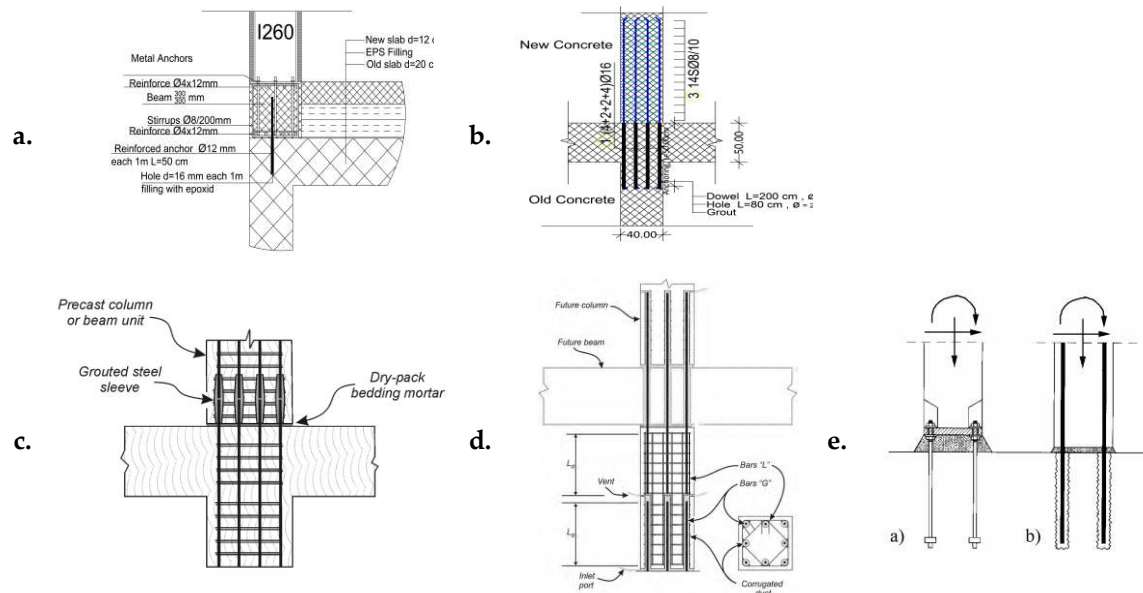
Several examples of connections executed in practice and from the literature (a) & (b) executed in Kosovo, ((c) [5], (d) [5], (e) [6]) for the addition of floors and prefabricated elements.
